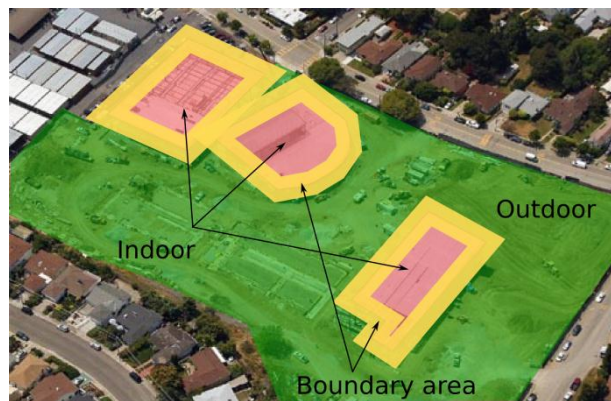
Indoor, outdoor and boundary areas on a construction site. Photo by Dave Piper (CC)
